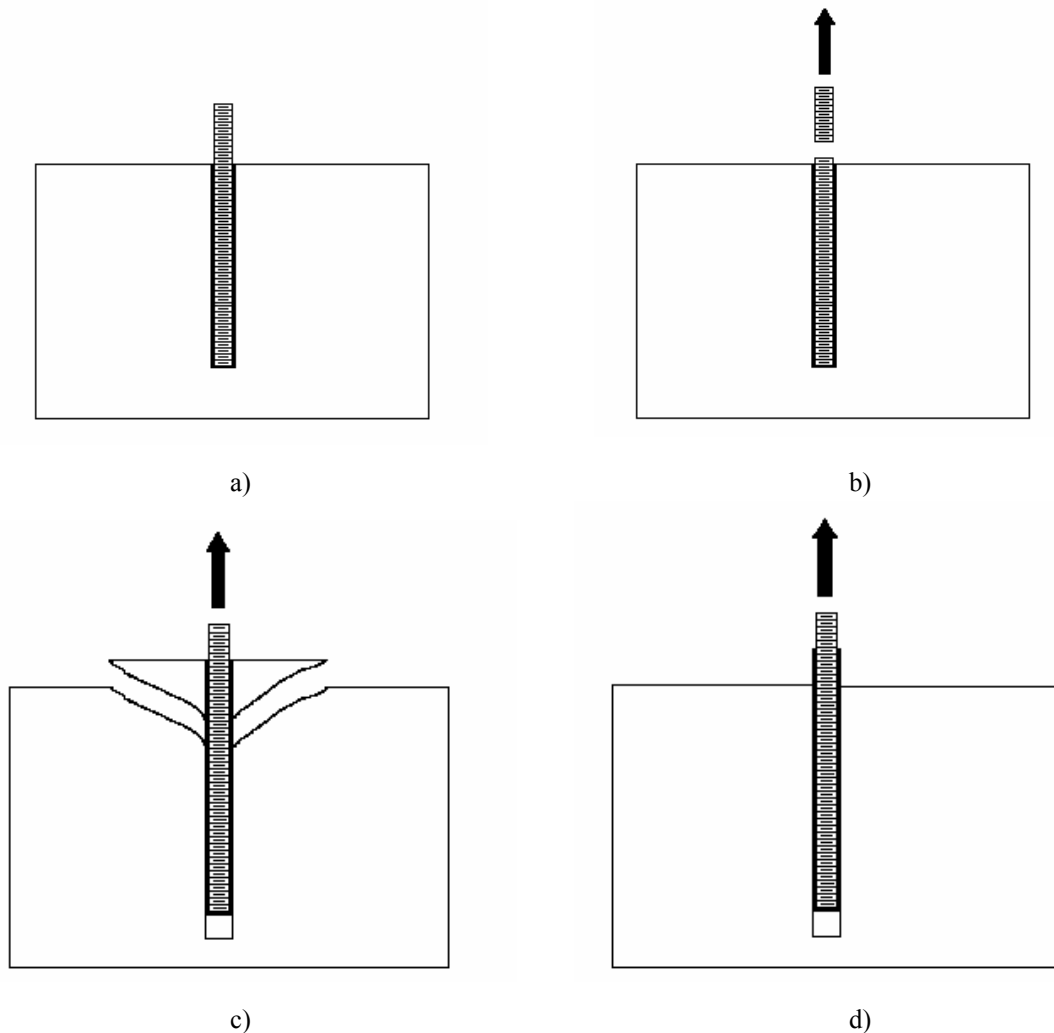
Failure modes for adhesive anchors: a) adhesive anchor; b) steel failure; c) concrete cone failure with or without pullout of an adhesive core; d) pull-out of adhesive anchor (Cook *et al.* 1993)
